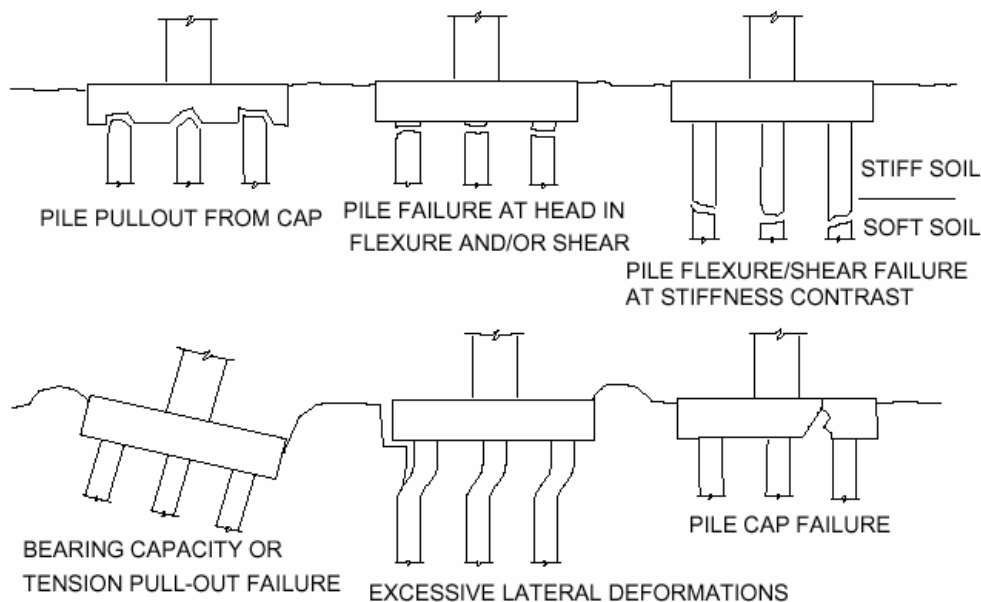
Potential failure modes for pile group foundation subjected to seismic load (after Meymand, 1998)
